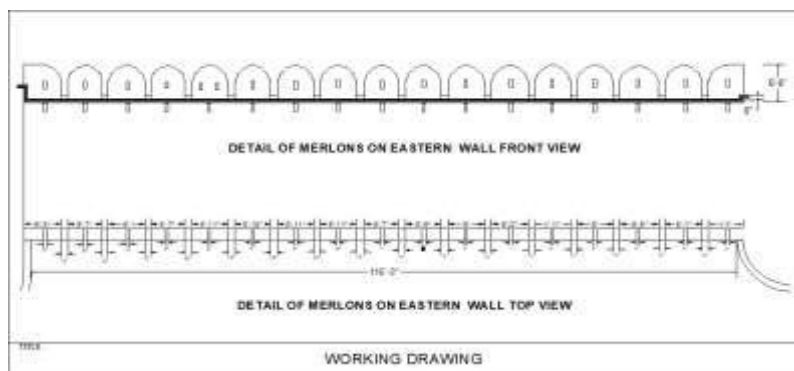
Working Drawing of Merlons on Eastern Wall (Front View and Top View) of RewatFort (after Saeed 2020, p.50)
